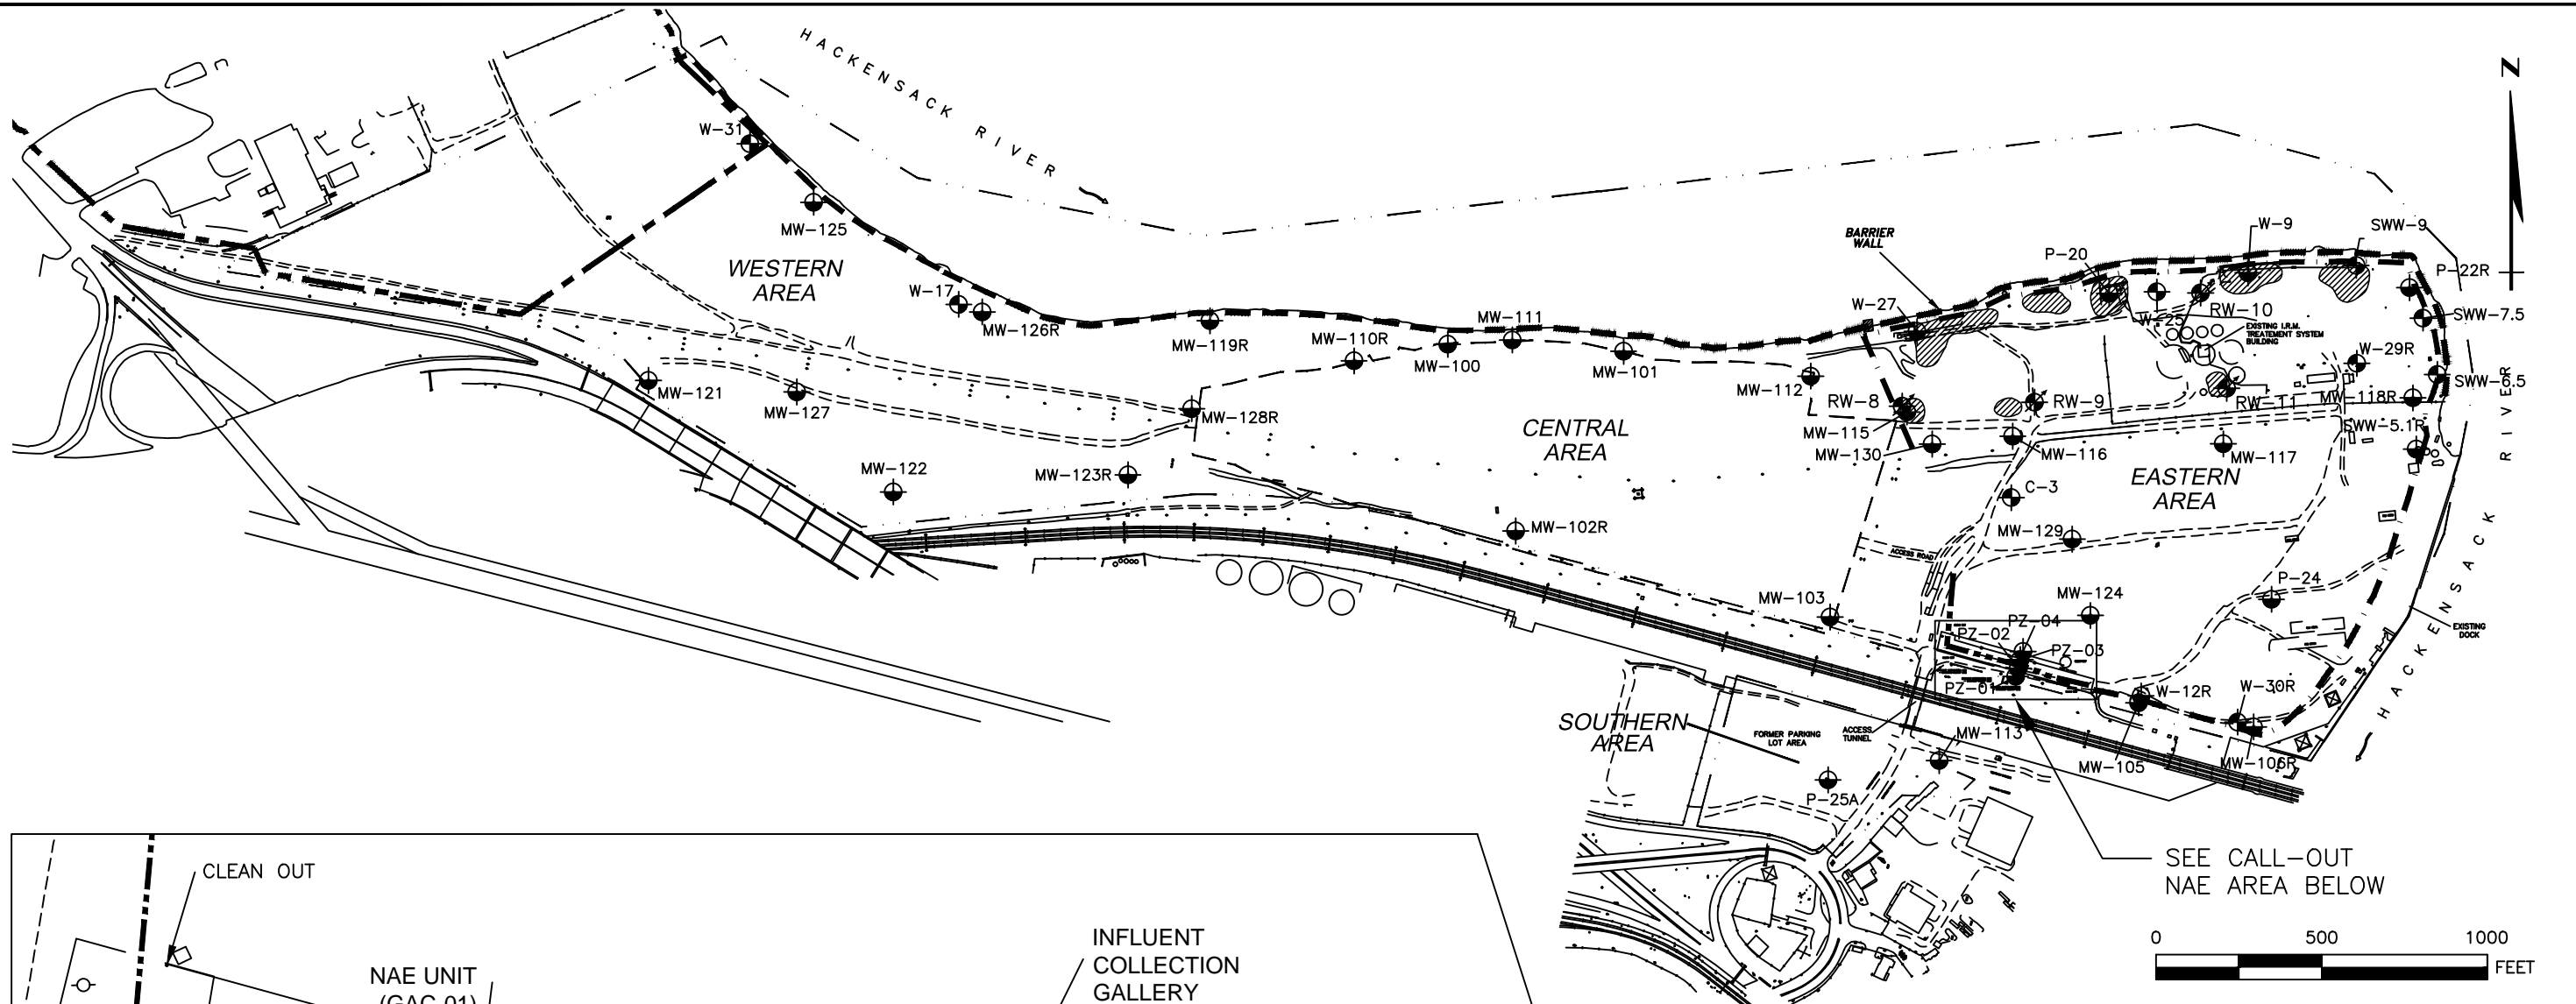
provides on-site monitoring well locations west of the Standard Chlorine slurry wall.
